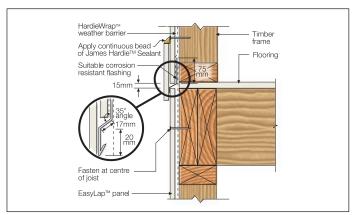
UPPER FLOOR JUNCTION OPTION 2
